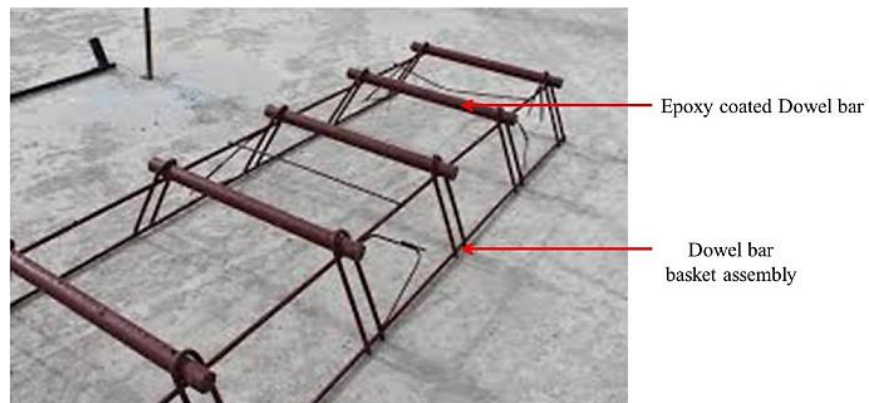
Assembly of dowel joints before applying concrete (Singh et al., 2023)
